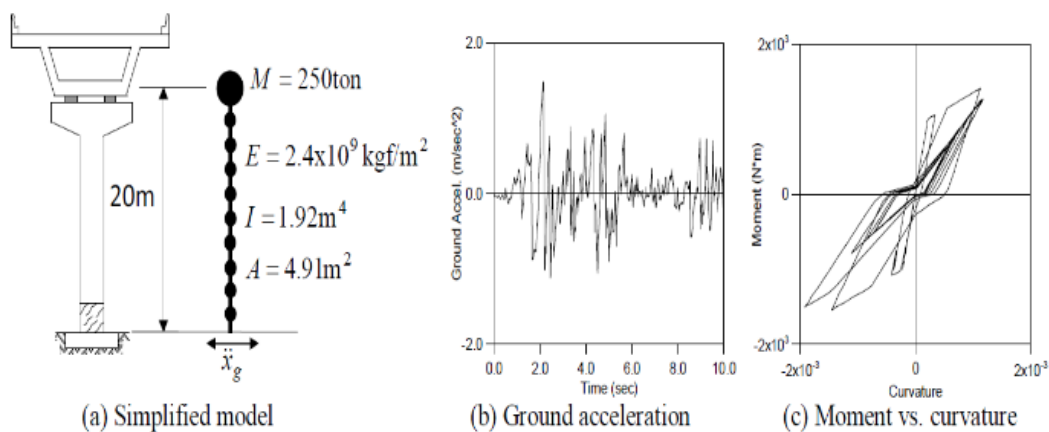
Cantilever model of bridge pier subjected earthquake excitation
